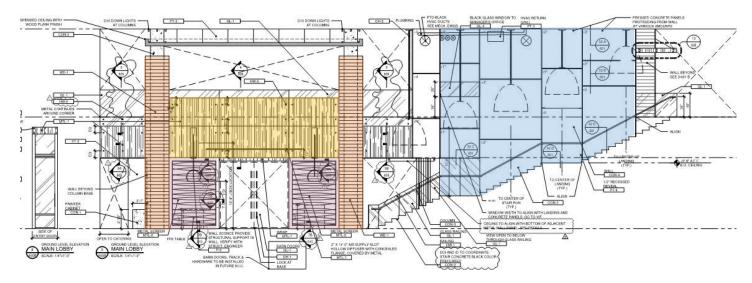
| Ground Floor Interior Elevation - Lower Level Lobby
